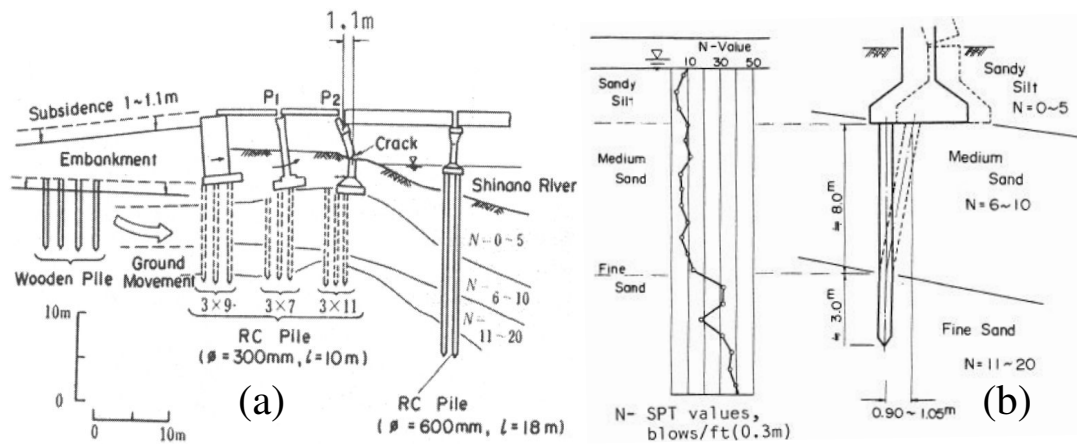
Damage to Yachiyo Bridge due to lateral spreading: (a) damage to abutment and piers, (b) SPT profile and pile damage (Hamada and O'Rourke 1992). The damage was similar on the opposite bank.
